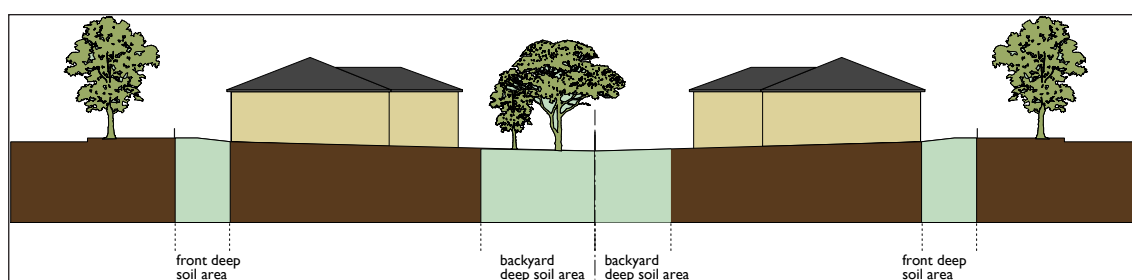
Deep soil areas are free of structures. They fit neatly around the building without obstruction of either above or below ground built elements such as outbuildings, driveways, impervious surfaces, basement garages, detention tanks or paved terraces.
